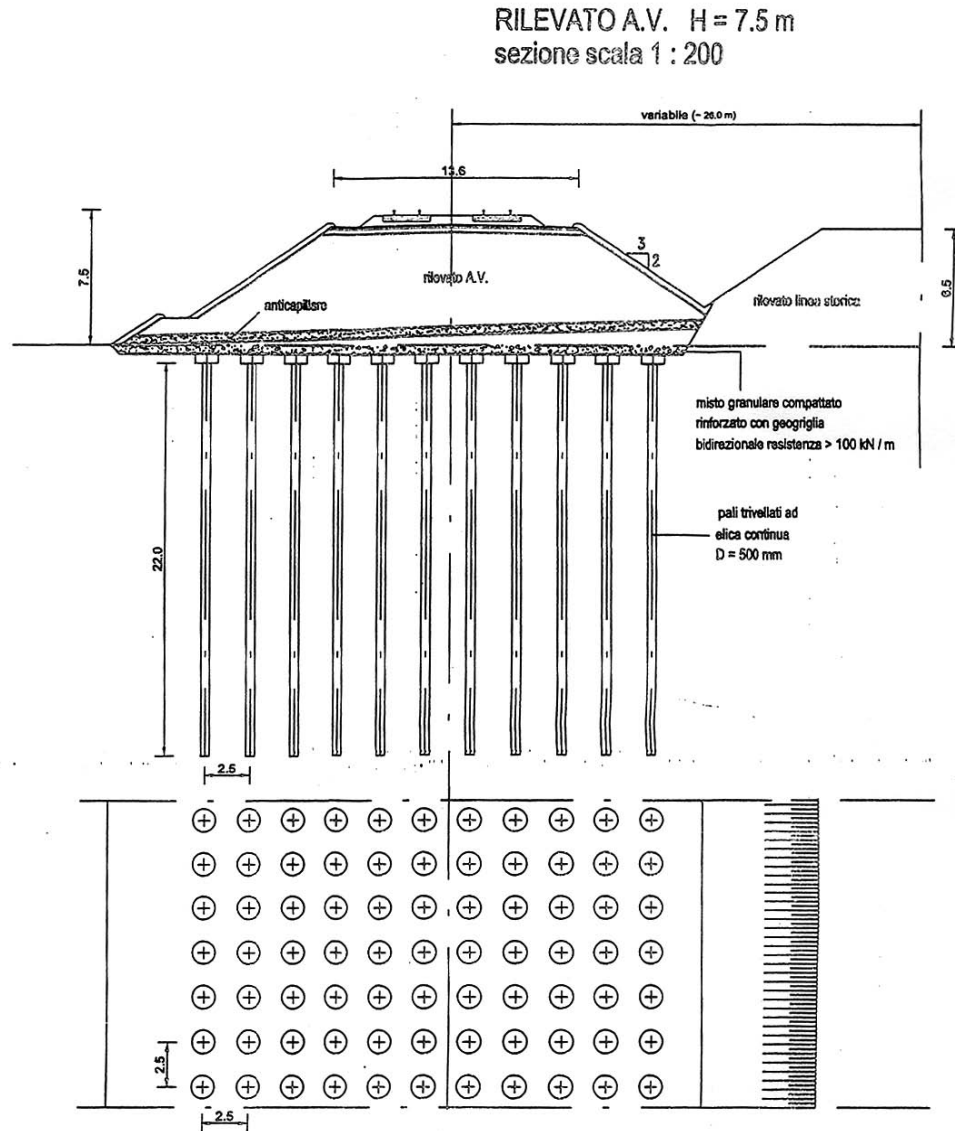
CFA Pile Supported Railway Embankment for Italian Railway Project
